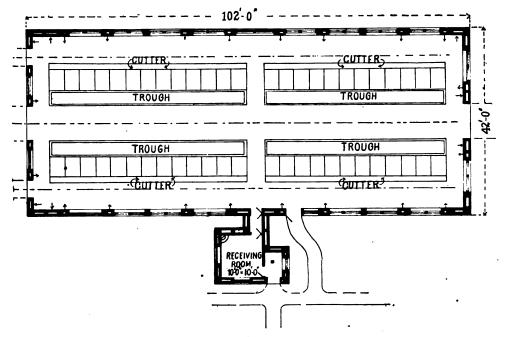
BROOKSIDE DAIRY BARN (ARRANGEMENT OF GROUND FLOOR).
